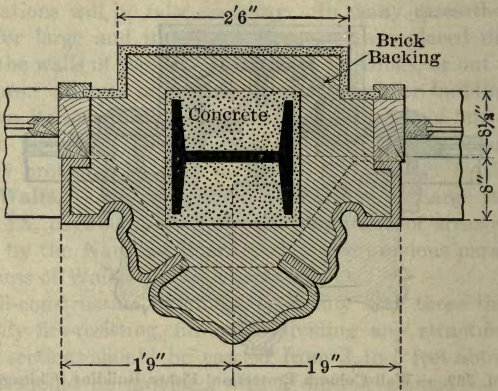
Typical Wall Column, Filene Building, Boston.
